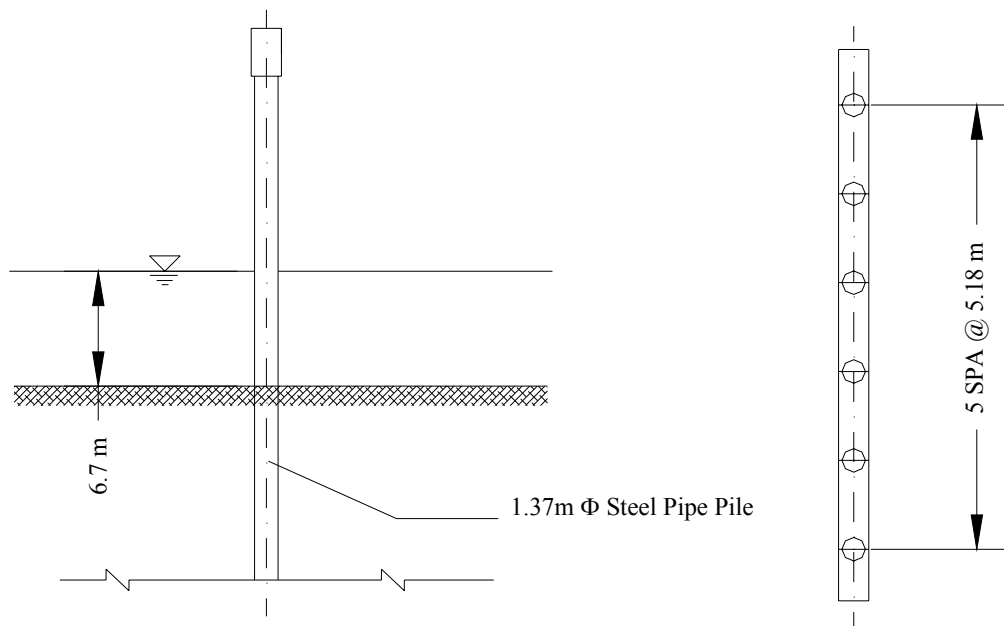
Geometry of the Franking Pier at the New Sloop Channel Bridge
